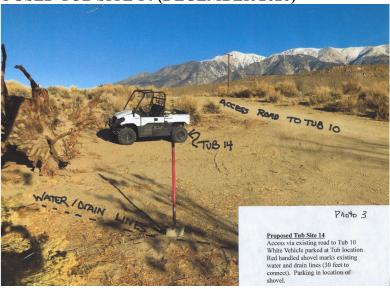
PROPOSED TUB SITE 14 (NOVEMBER 2020)
